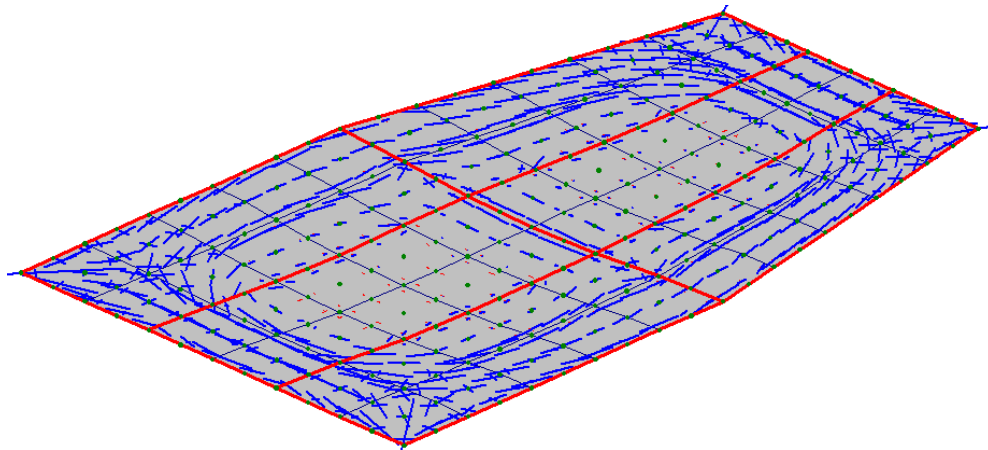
Layout for continuous trapezoidal slab panel
